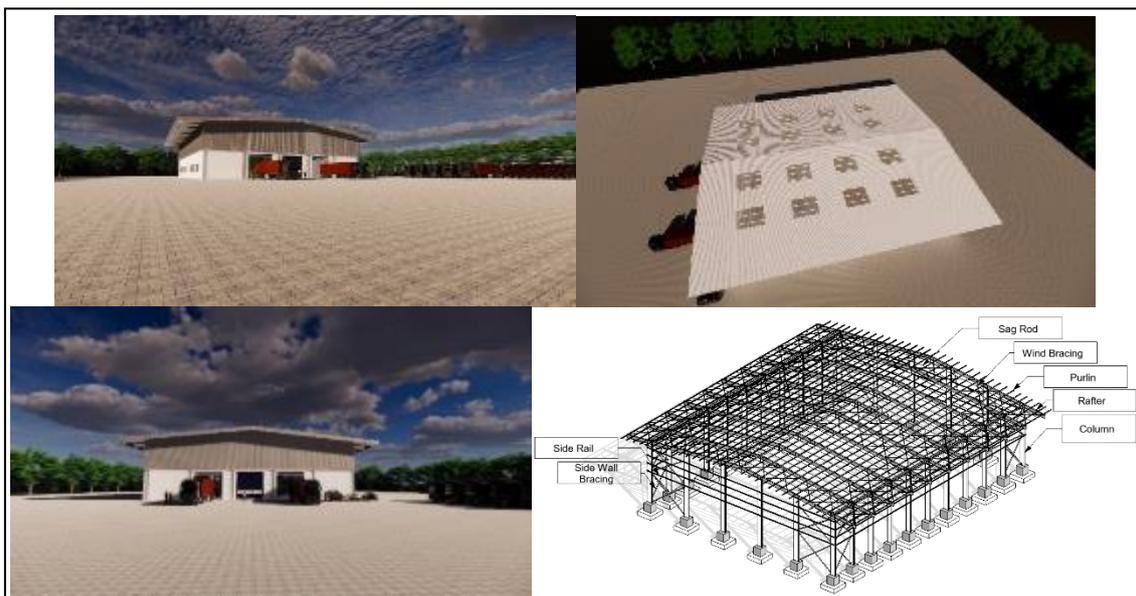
Revit: The 3D shape of a 40 m span industrial building plan (model 2)
